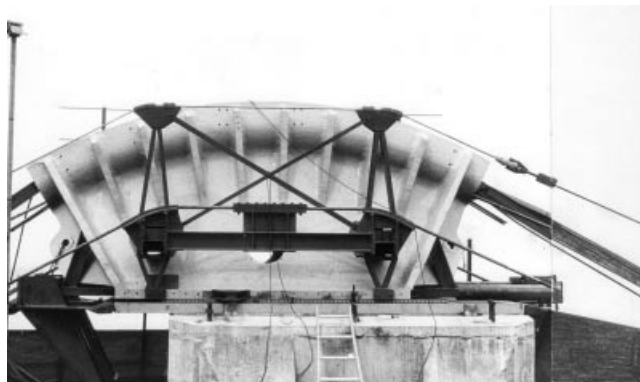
Saddle supported by a longitudinal girder inside a steel pylon
